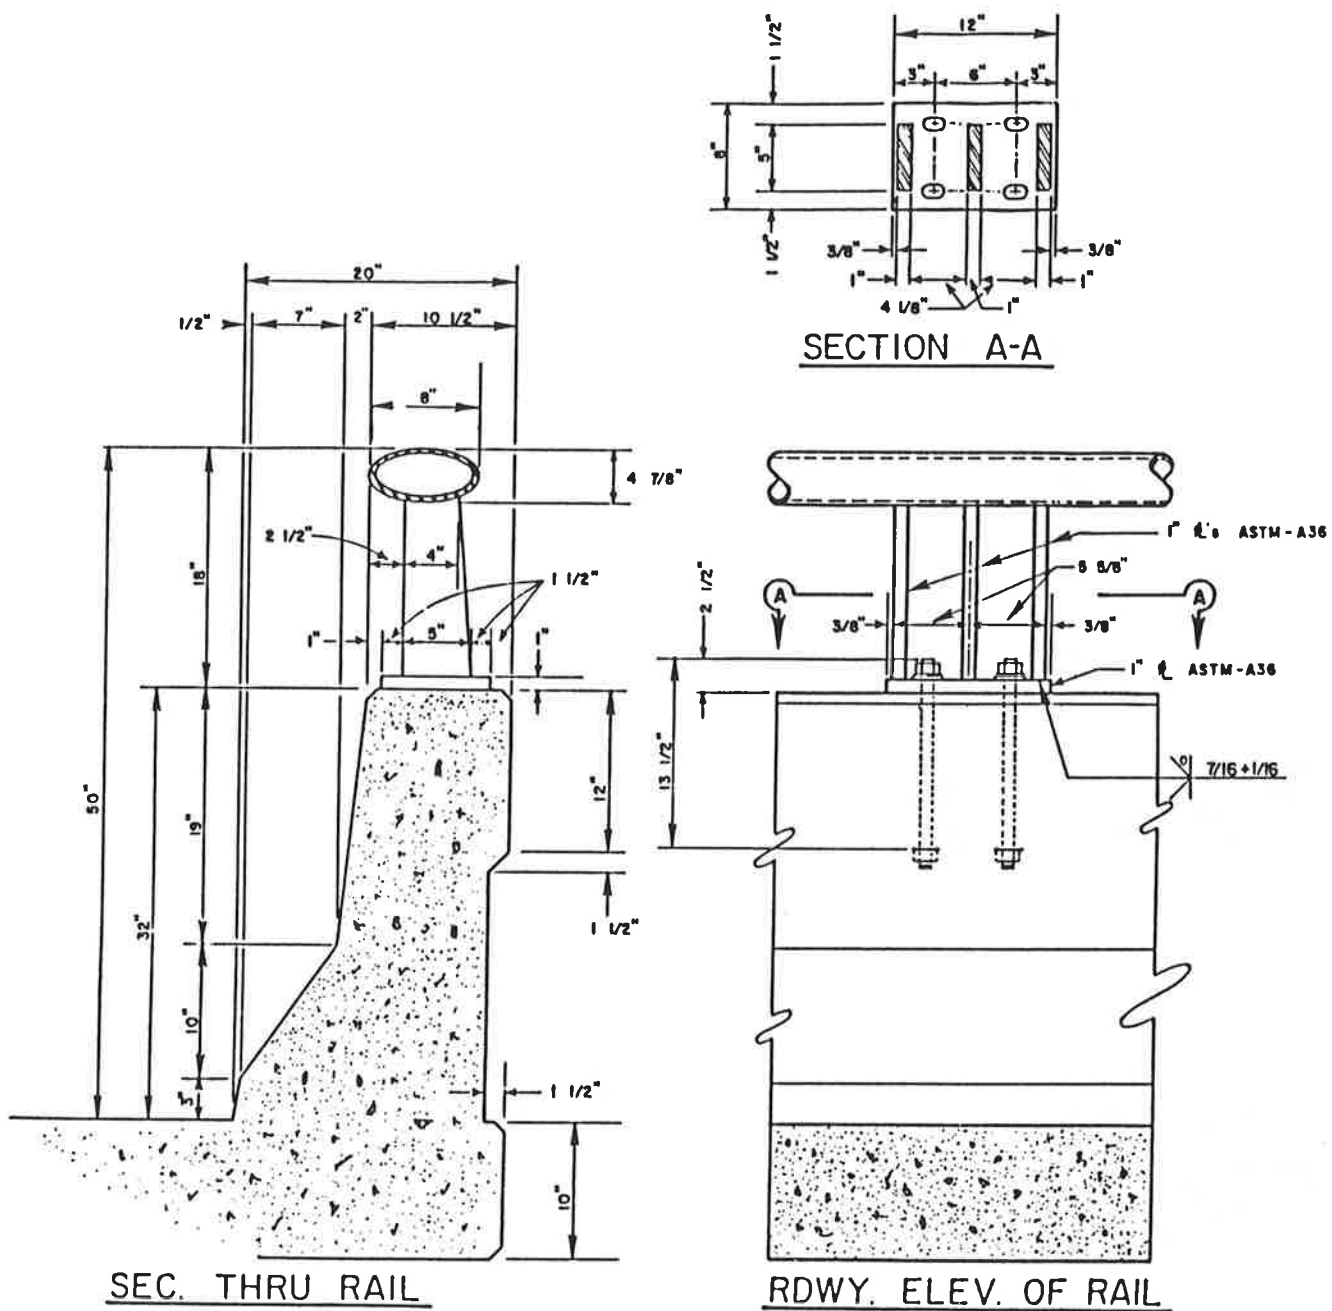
Dimensions and elevation of the modified T5 bridge rail.
